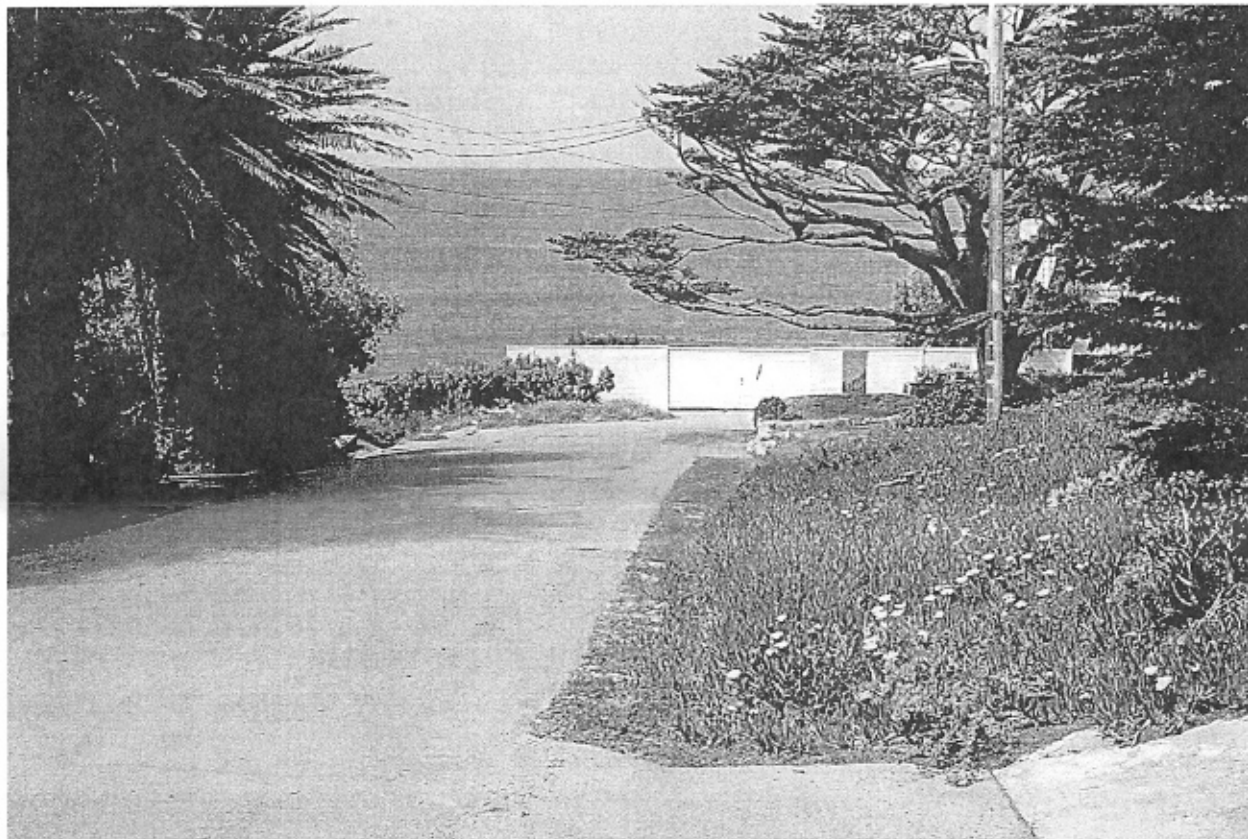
Photo showing overview of Project site. Project activities involve removing the white wooden fence and installing 4 metal bollards along the coastal bluff edge near the fence. Additionally a metal guard rail will be installed along the edge of pavement adjacent to the fence and myoporum shrubs. See Appendix A Figure 4 for Project Sketch.
